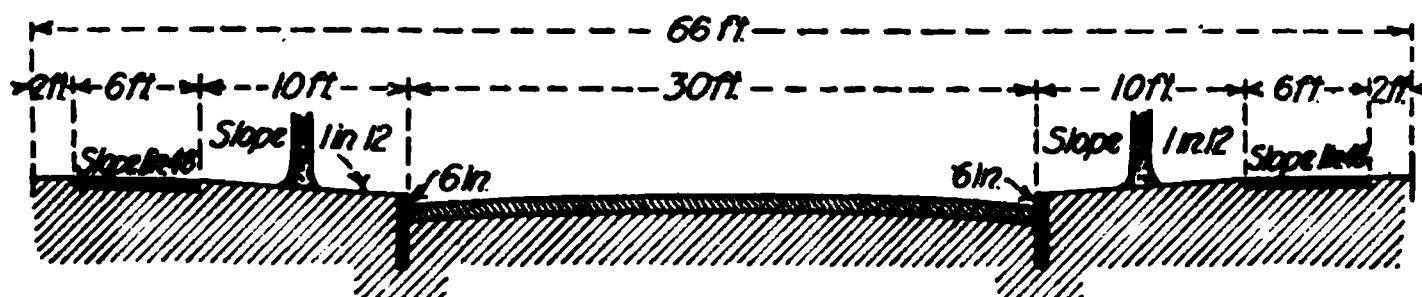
CROSS SECTION OF STREET ON LEVEL GROUND.
